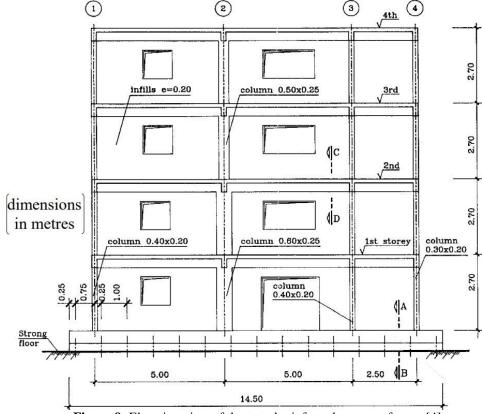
Elevation view of the tested reinforced concrete frame [4]
